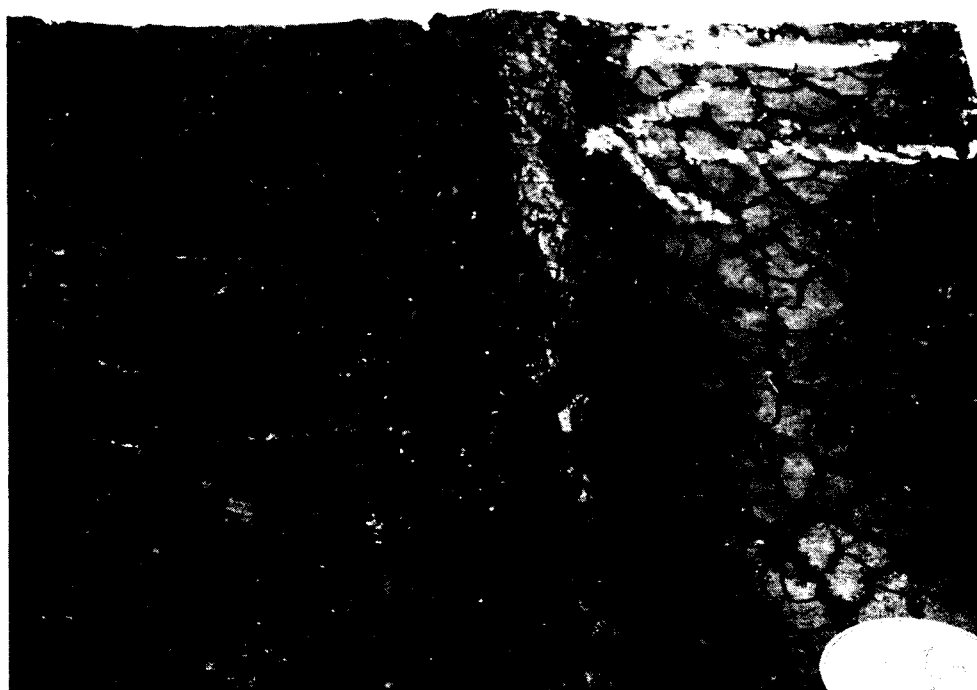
ALLIGATORING OF BITUMINOUS SURFACE DRESSING, WITH SPLIT IN UPPER SURFACE OF MEMBRANE OVER JOINT IN INSULATION (NOT SHOWN). NOTE SLIGHT RIDGE (CASE STUDY 2.1.5)
